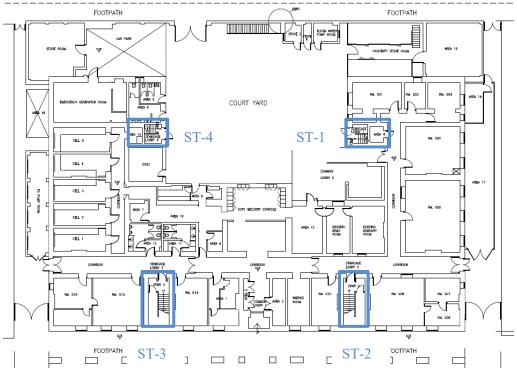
Location plan of Stairs 1-4 2011 [ArchSD plan modified by author]
